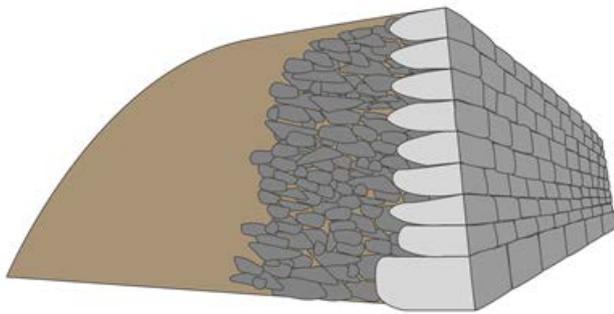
Cross section of fortress wall built in a Soil-in & Stone-out construction method. (Created by the author)
